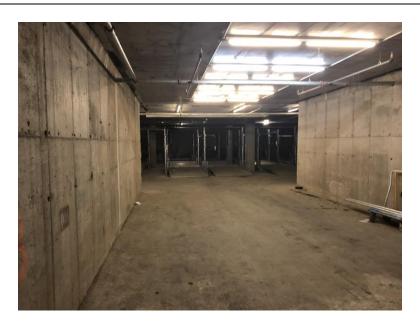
View of the concrete floor of the cellar in the West Tower; facing southwest. Dated 12/19/2017.
